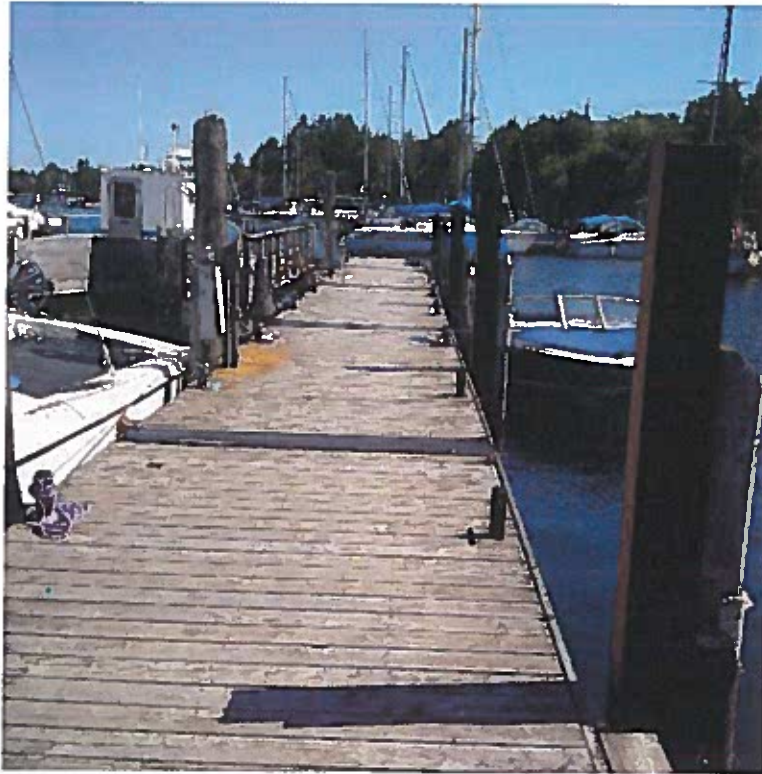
Steel-Framed Alley Dock Supported by Wooden Piles to the North (left of image) and Steel H-Piles to the South (right of image), Looking East
